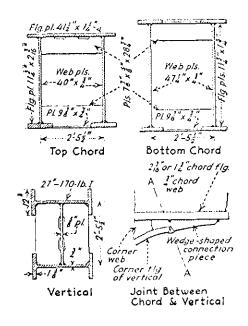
Structural details of Hasselt Bridge members; numerous fractures occurred along line AA (25)
